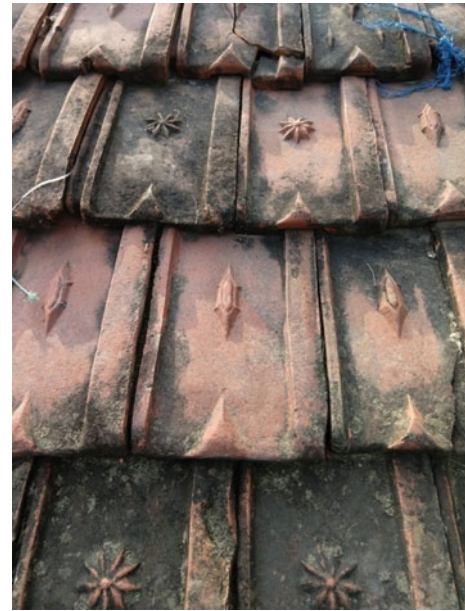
Common form of tiles on roof in Bhagalpur
